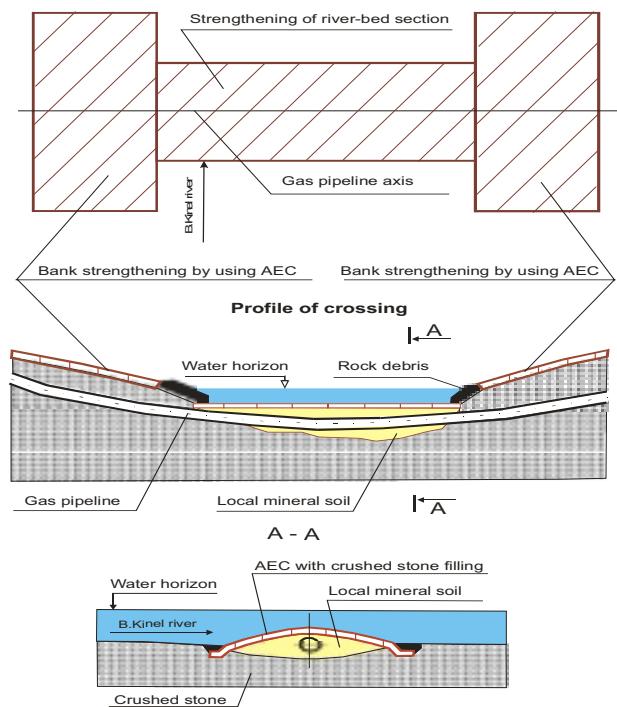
Construction for bank strengthening and bottom strengthening for underwater crossing of gas pipeline over the B. Kinel river.
